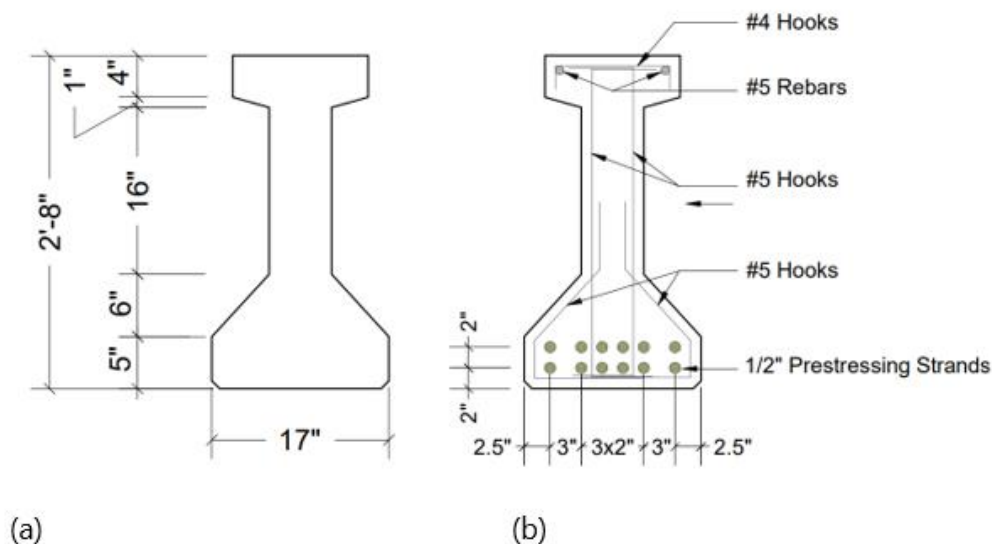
MoDOT Type II girder details (a) Concrete Dimensions, (b) Reinforcement Details
